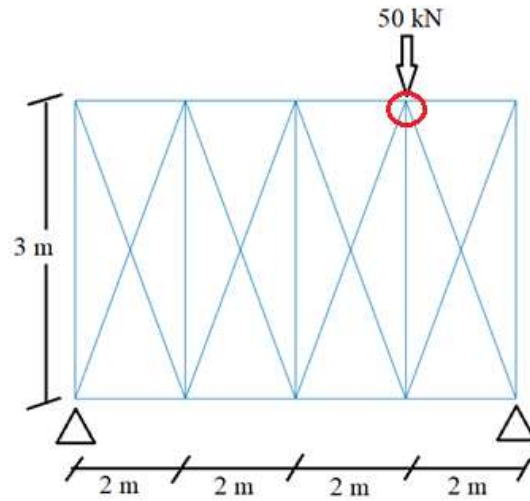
Ground Structure of Twenty-One Elements Truss Subjected to Third Load Case
